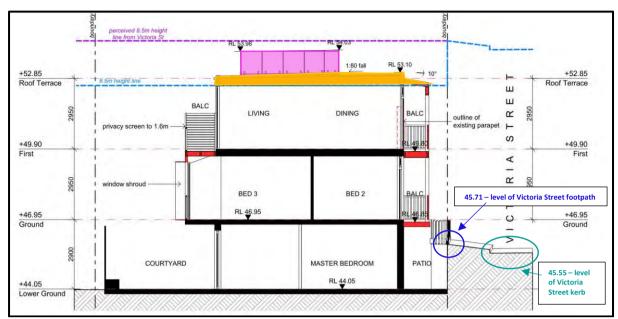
Height diagram showing non-compliant components – roof terrace balustrades (shaded in pink) and roof terrace/first floor roof (shaded in orange) and the existing lower ground floor level and existing residential levels' differences compared to Victoria Street
